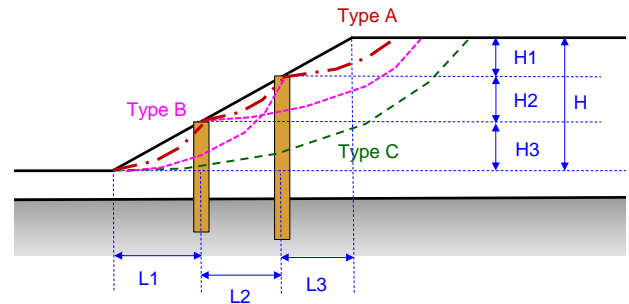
Illustration of different failure surfaces with multiple drilled shafts
